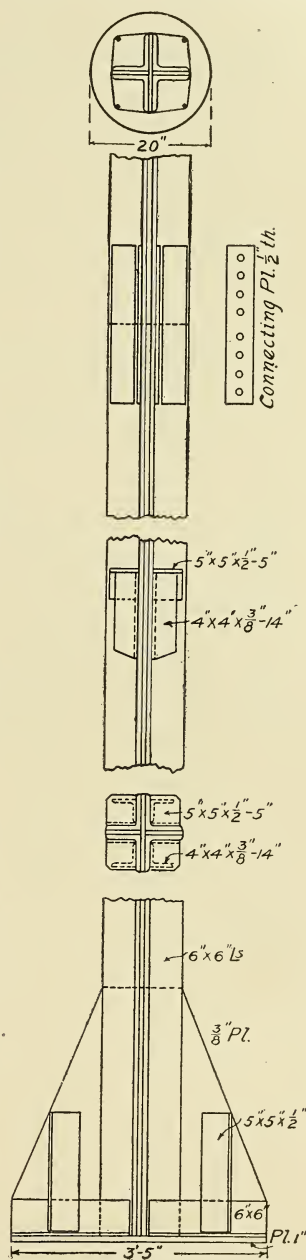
Steel Column Core for Buck Building, Philadelphia, Pa.
